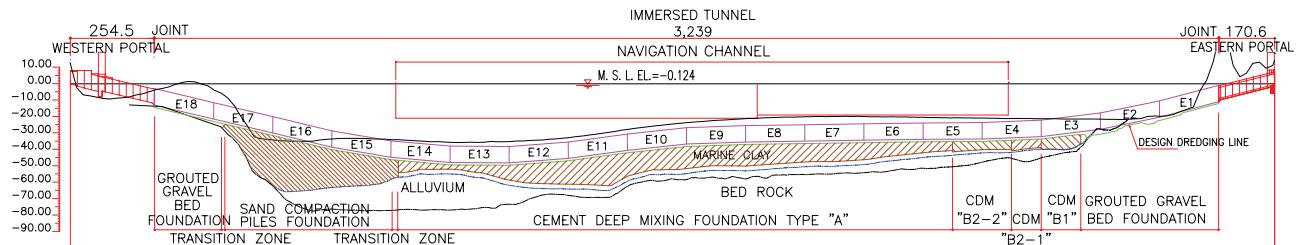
Long Section of the Immersed Tunnel alignment, showing foundation methods
